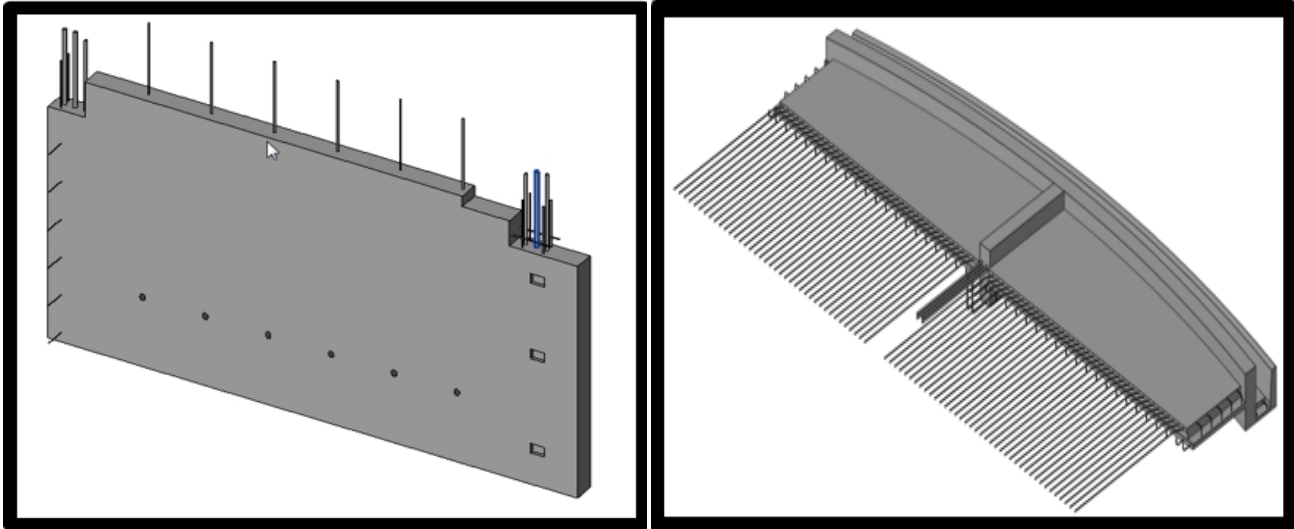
(a) BIM for precast wall (b) BIM for precast balcony
